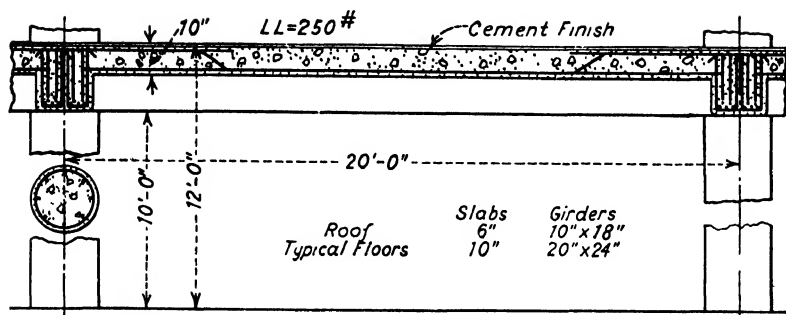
Type 1. 2-Way Slab and Girder Floor for 8-Story Warehouse. (See p. 786.)
